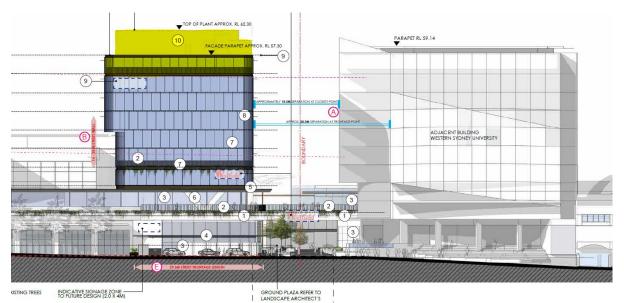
Extract of building height from the revised architectural drawings (area marked in yellow is part of building that exceeds the building height of 35m).
